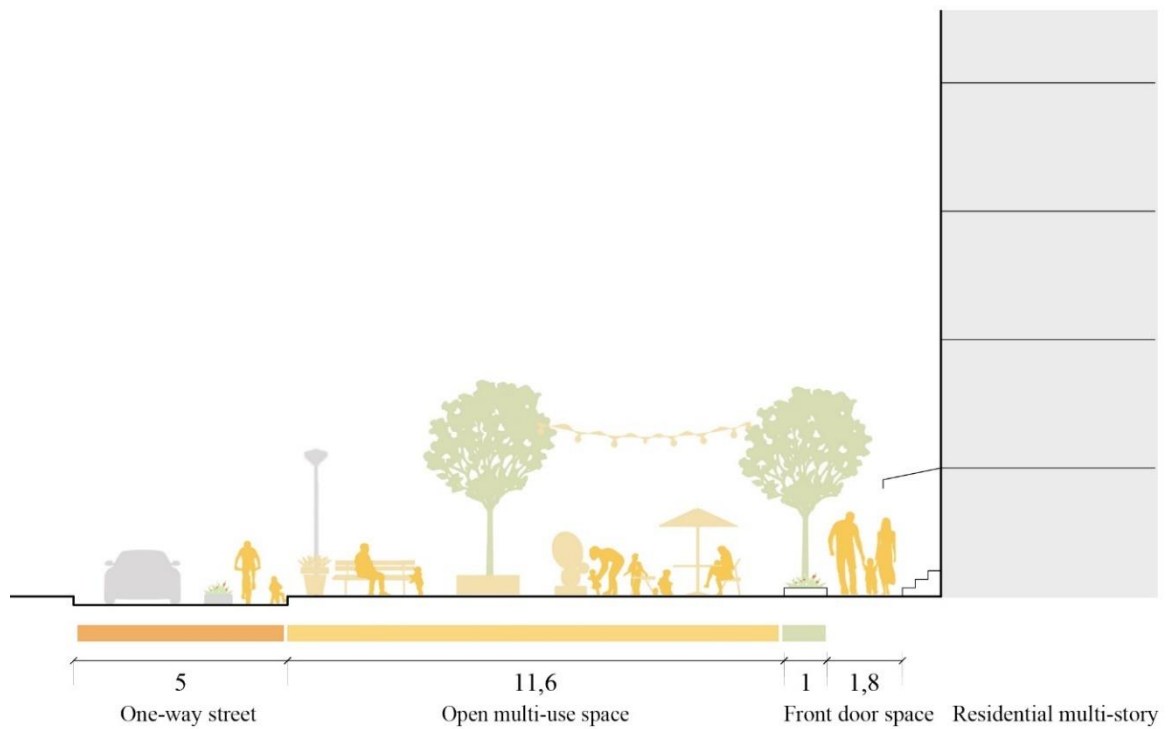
Open space for the community with additions like guerrilla gardening and parking converted into multi use open space.
